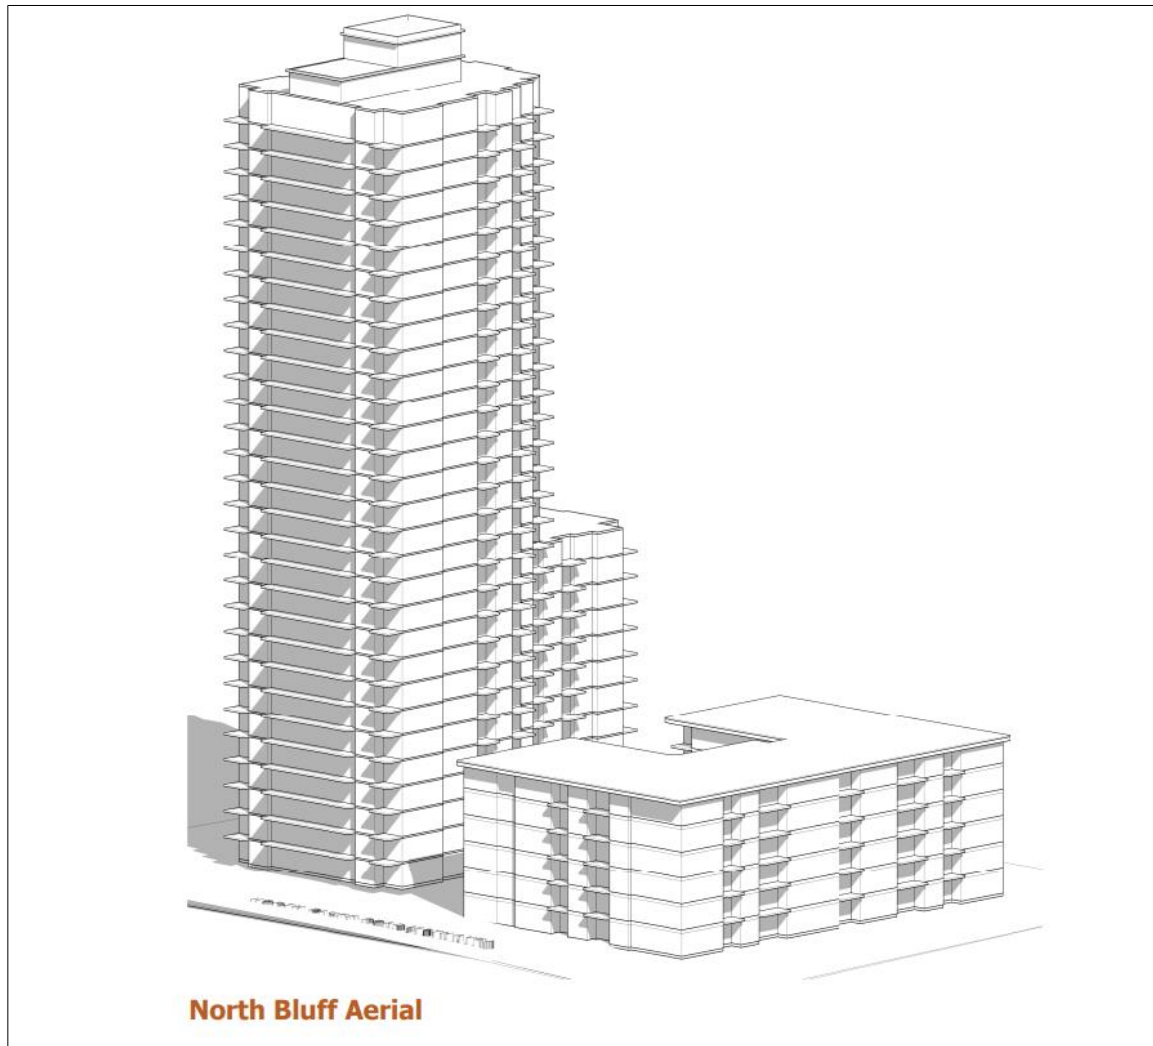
Schematic rendering of buildings for 14990 North Bluff Road
